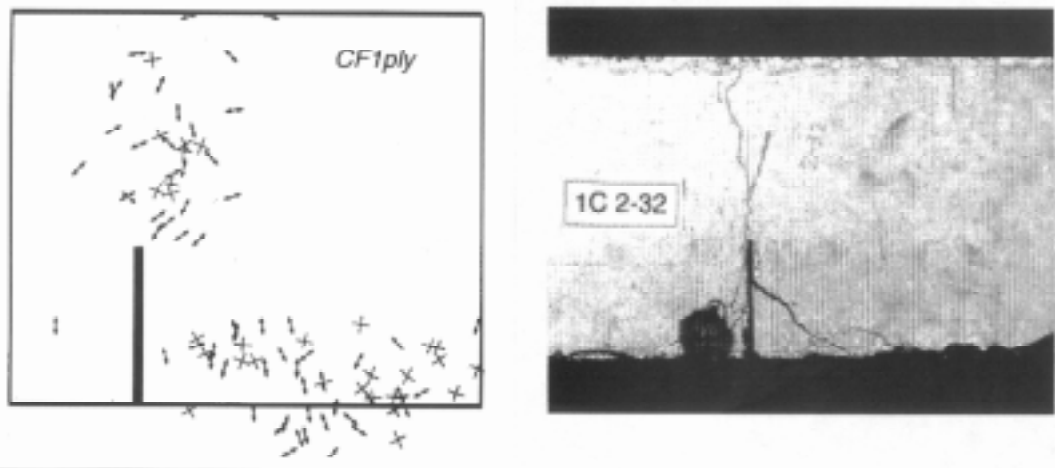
Crack type and orientation in the carbonfiber 1-ply reinforced concrete specimen analyzed by the moment tensor method (left) and the failed specimen (right).
